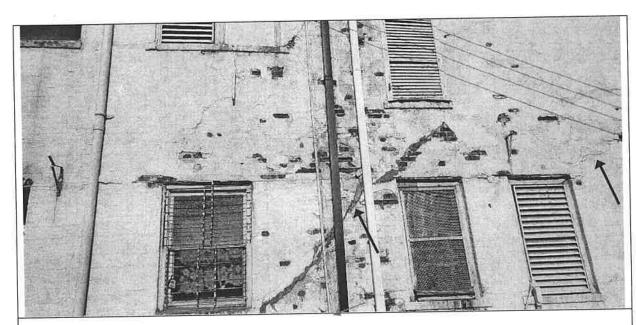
East Exterior Wall: Note significant structural diagonal cracks.
